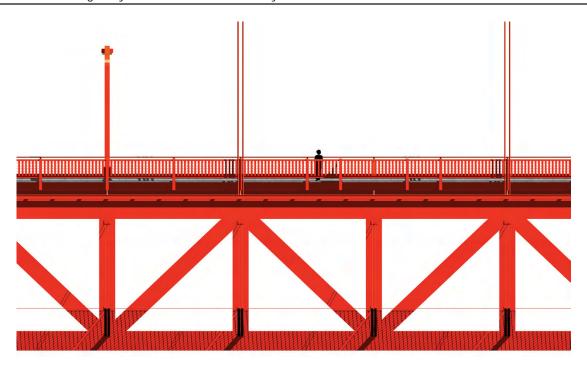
ALTERNATIVE 2B: ELEVATION AT BELVEDERE
